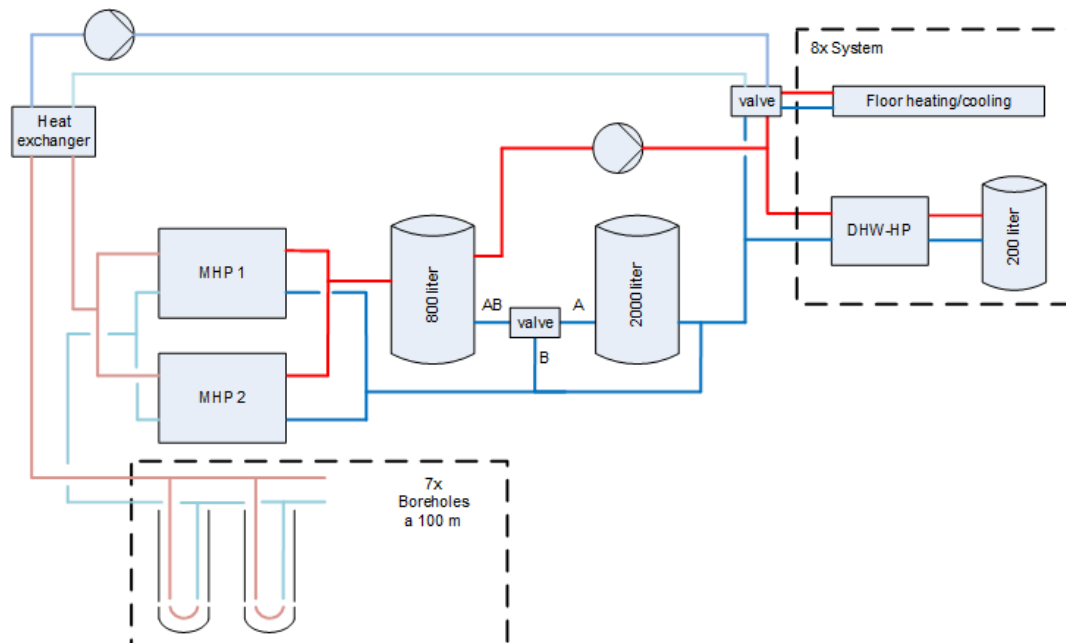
Building technology of the Herzo Base - houses with ground-coupled heat pump and DHW-HPs
